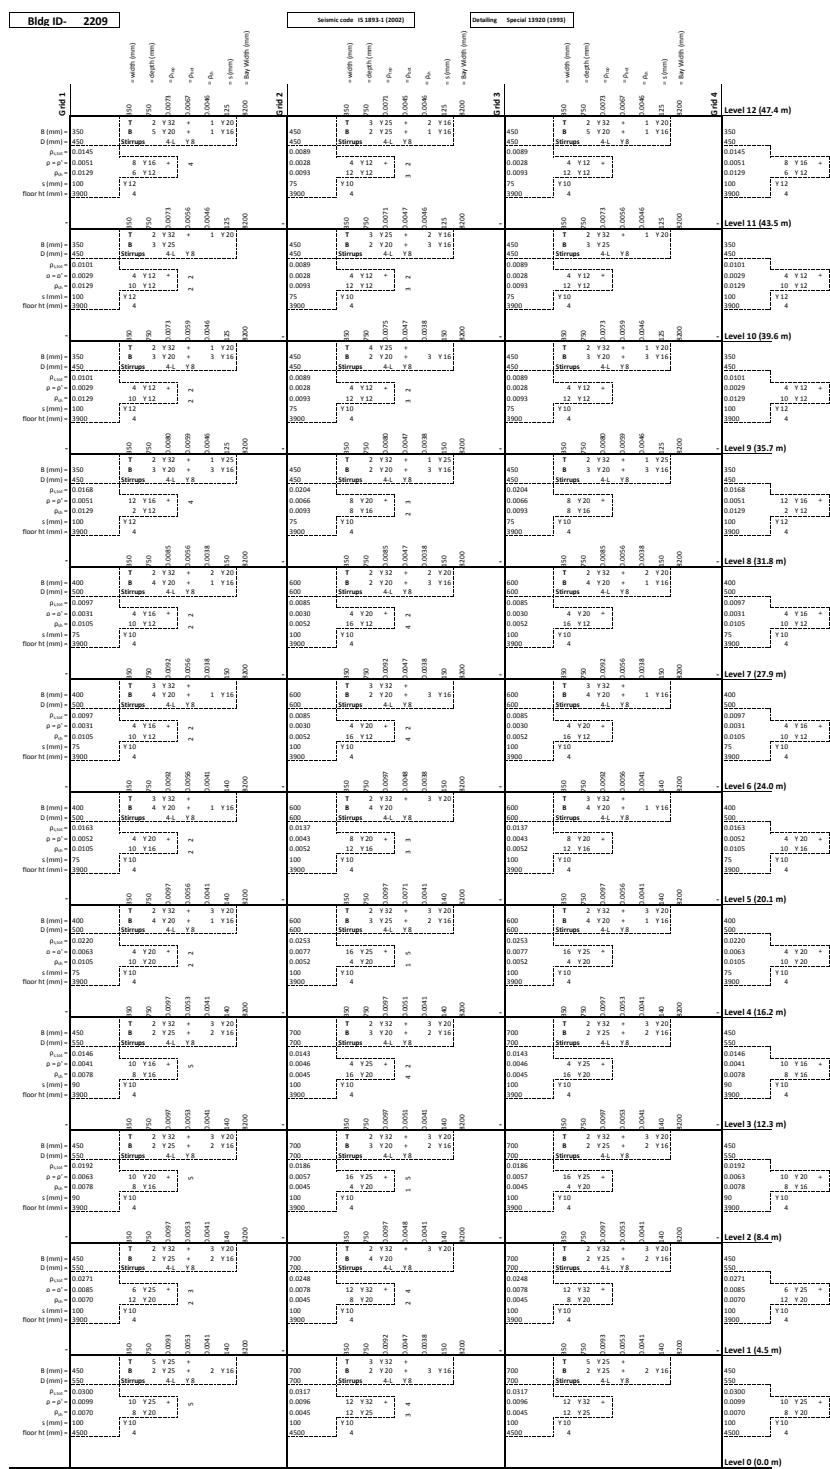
Provided reinforcement and detailing details for building ID 2209
